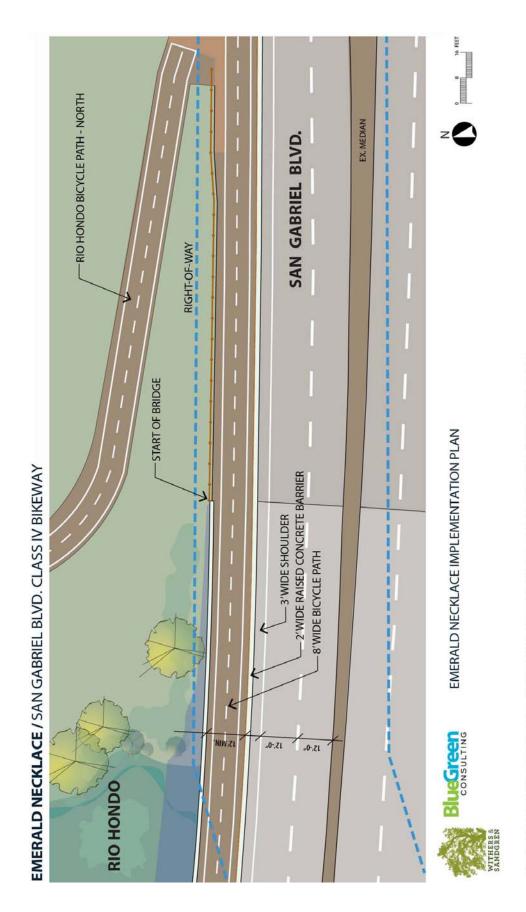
Plan view of the proposed San Gabriel Blvd. Class IV Bikeway on the existing San Gabriel Blvd. Bridge.
